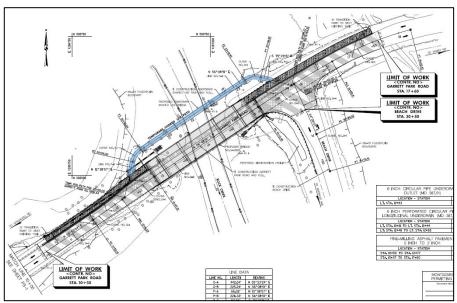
Proposed Temporary Pedestrian/Bicycle Bridge and Sidepath Connections
